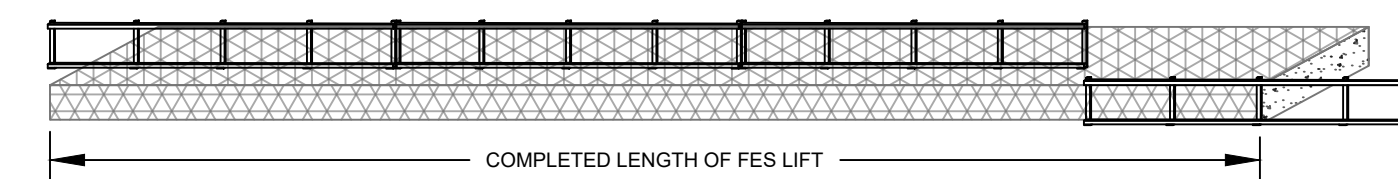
CONSTRUCT FES LIFTS ALONG LENGTH OF FIRST SET OF FORMS AND THEN BEGIN PLACEMENT OF FORMS AND CONSTRUCTION OF SECOND LIFT.
